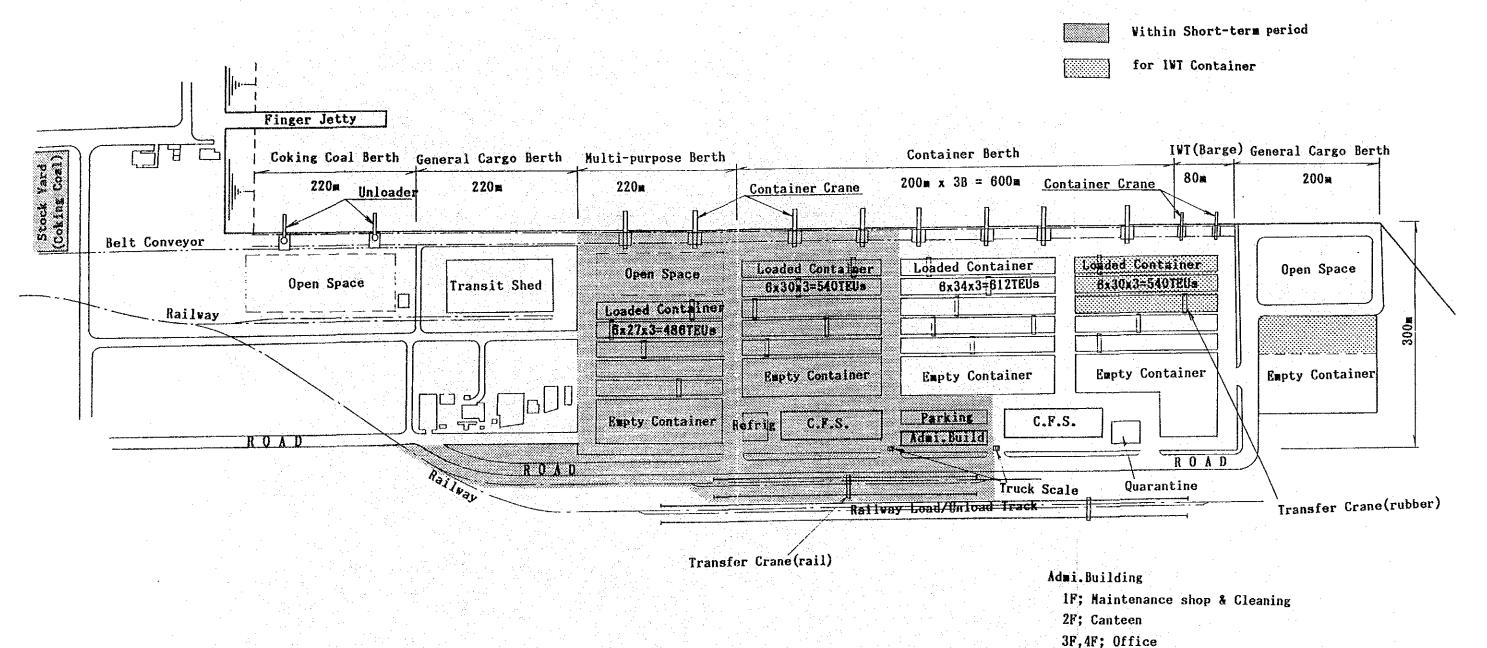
Layout plan of Container Yard at Haldia
